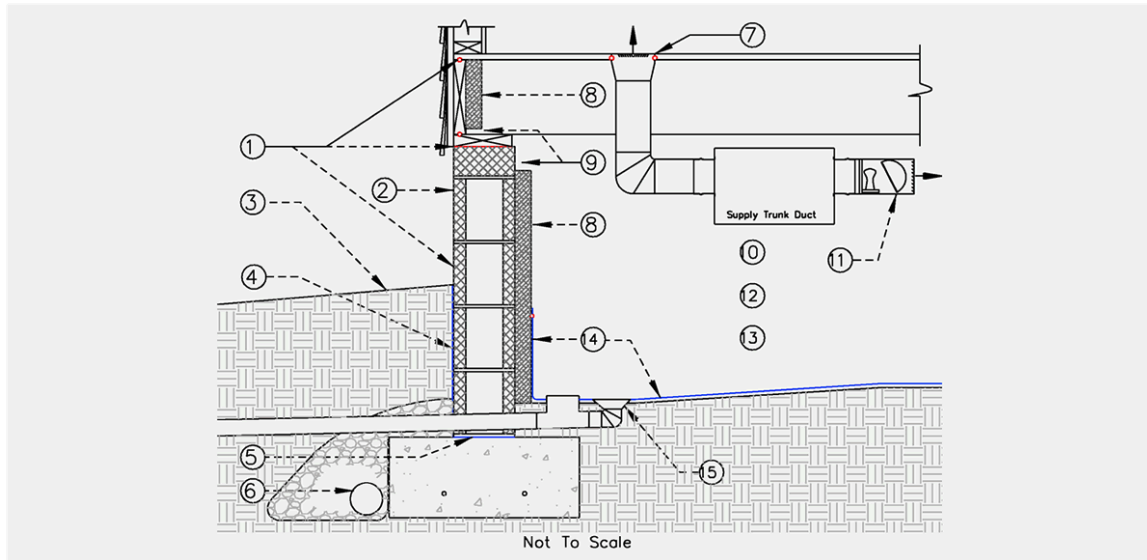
Sealed crawlspace with insulation at the exterior perimeter and without floor insulation.
